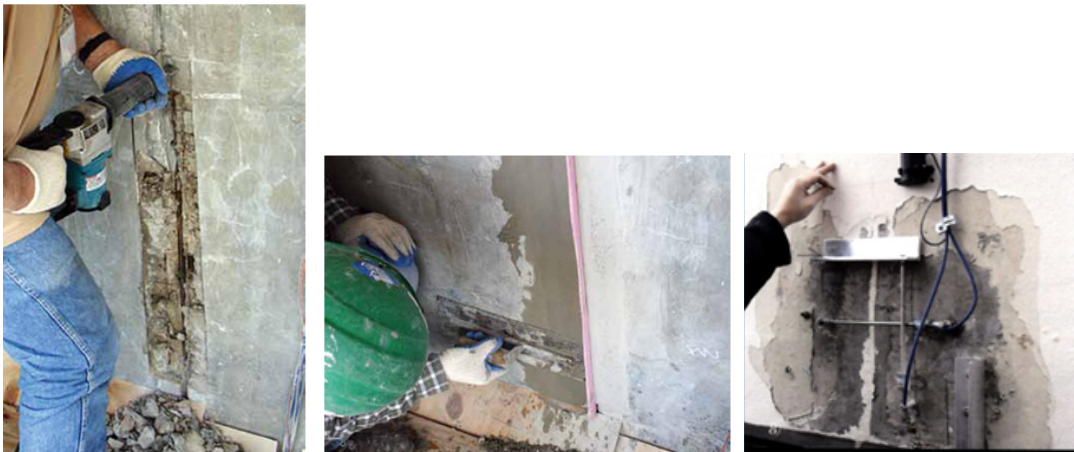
Cracks are opened up, steel elements rendered passive. Dilation joints are created by disked the concrete and inserting filler. The wall surface is then reconsolidated.
